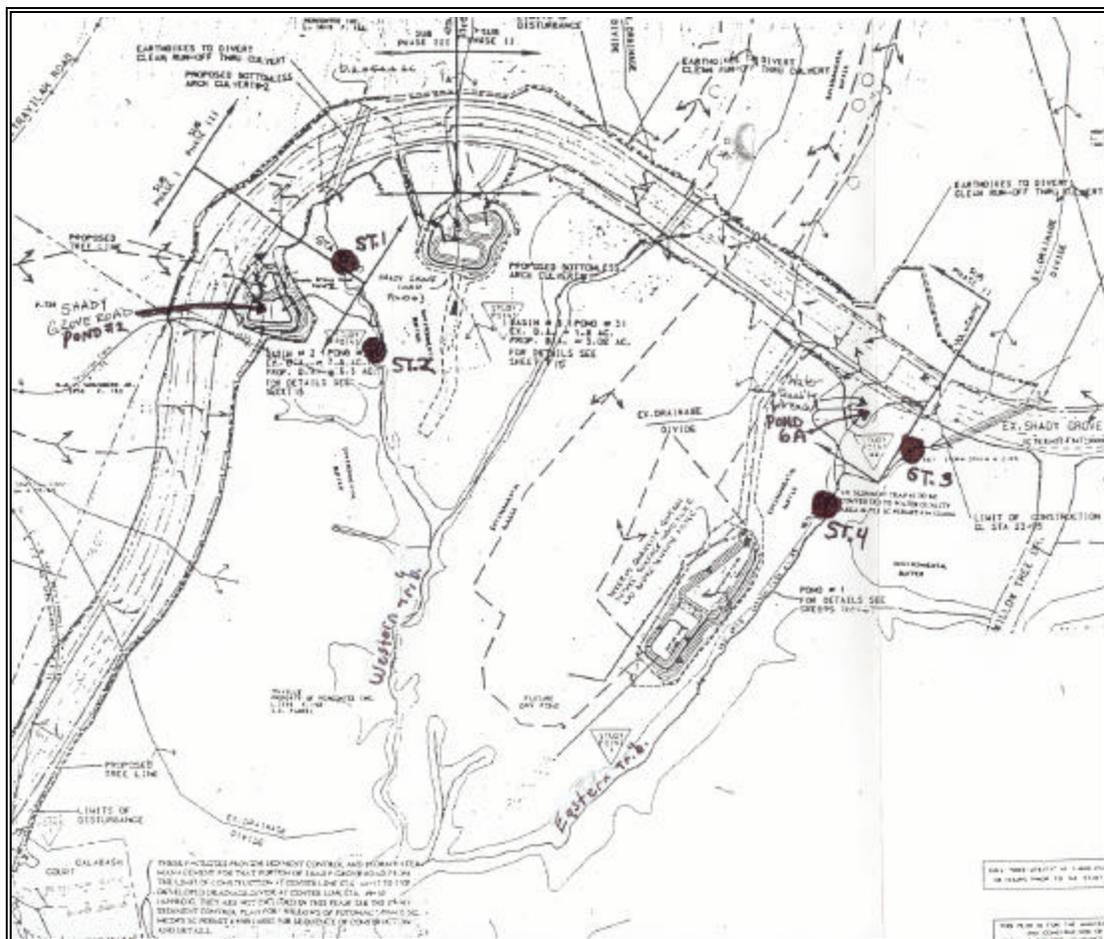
Site Map of Shady Grove Road Extended Construction Project
